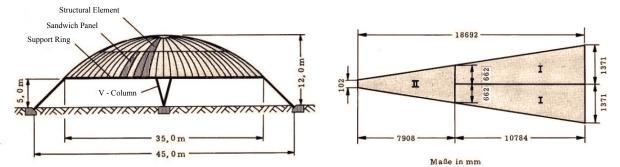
Dome by O. Jungbluth and a Structural Sandwich Element. Figs. 1 and 2 in [2].
